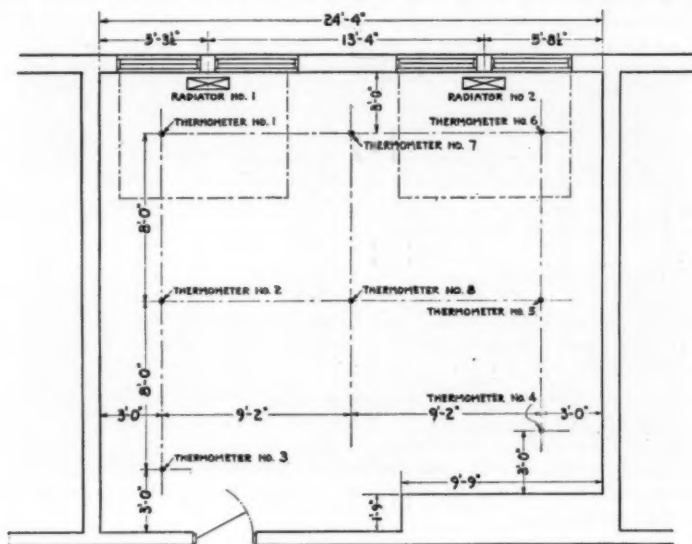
PLAN OF TEST ROOM (CEILING HEIGHT 12'-8")
